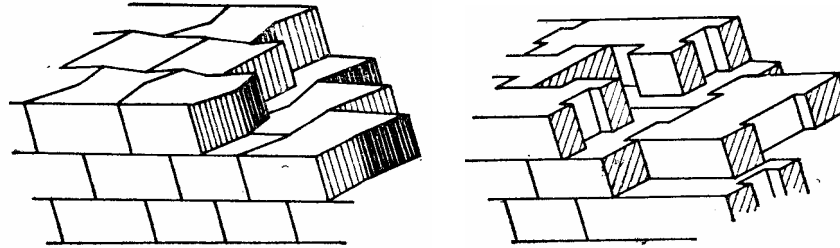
Size stone masonry blocks in the shape of dovetail joints and blocks with right threshold (used in elevation masonry works of art, monuments, columns, vaults, breakwaters, quays, etc).
